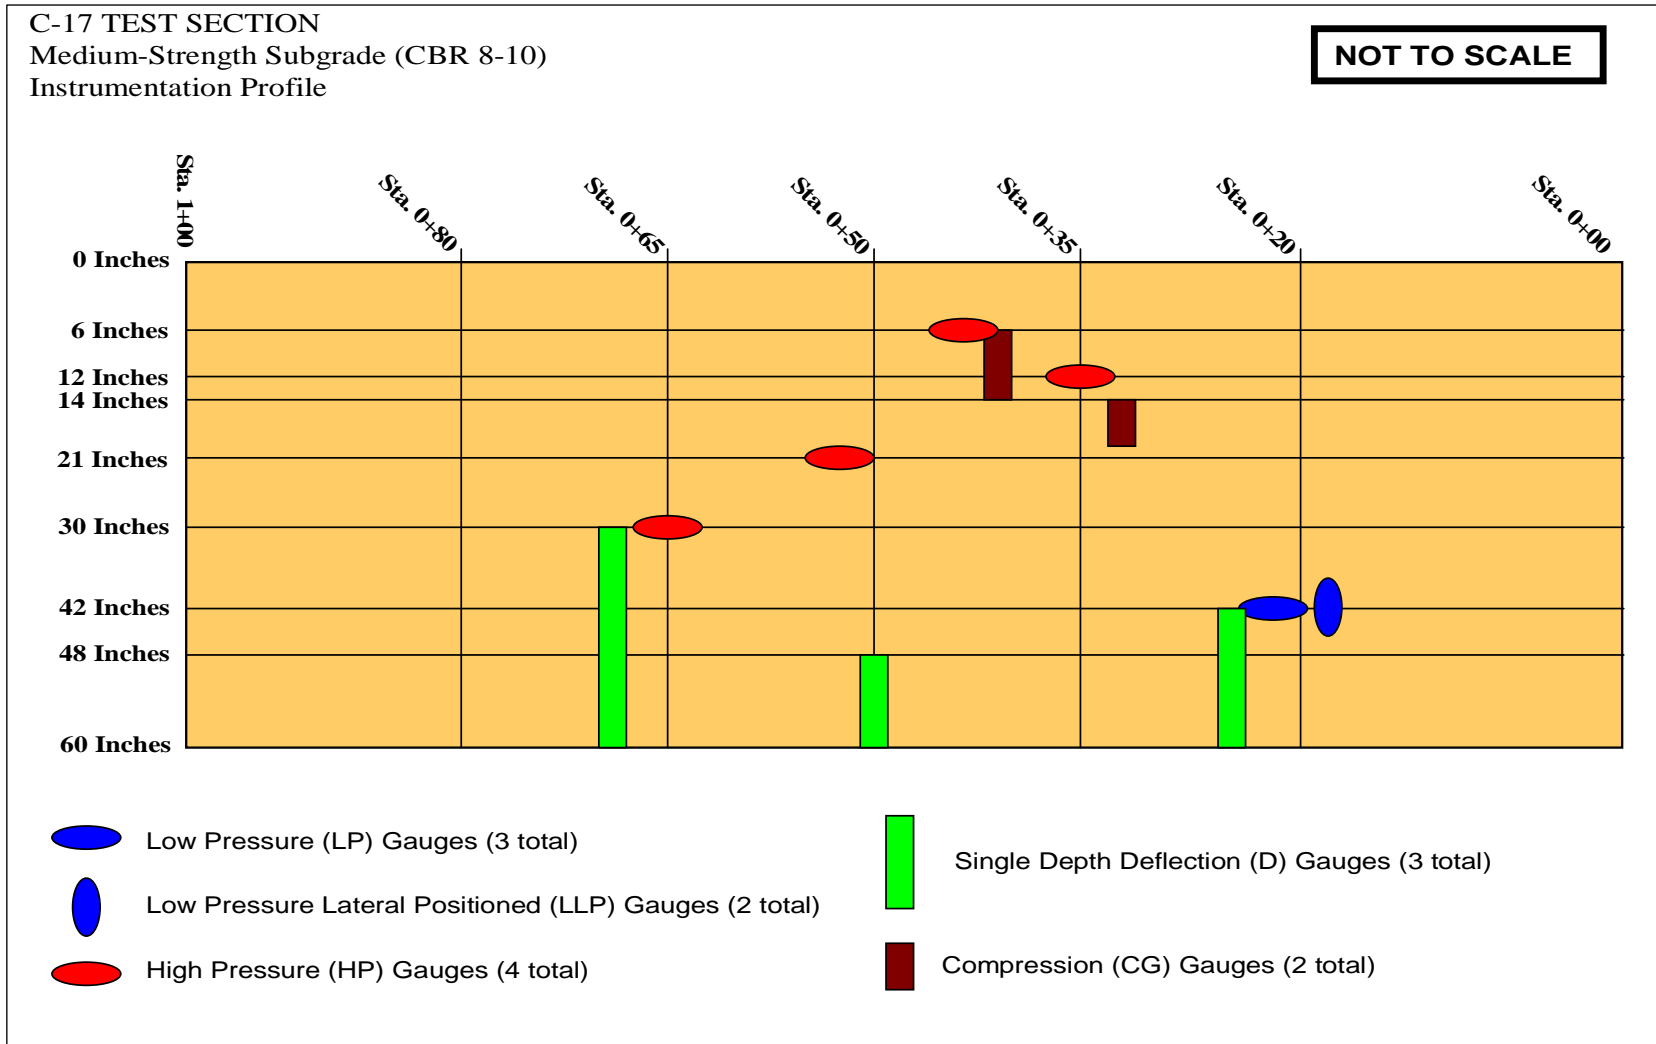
Test Section/Instrumentation Profile – Silty Sand Test Section
